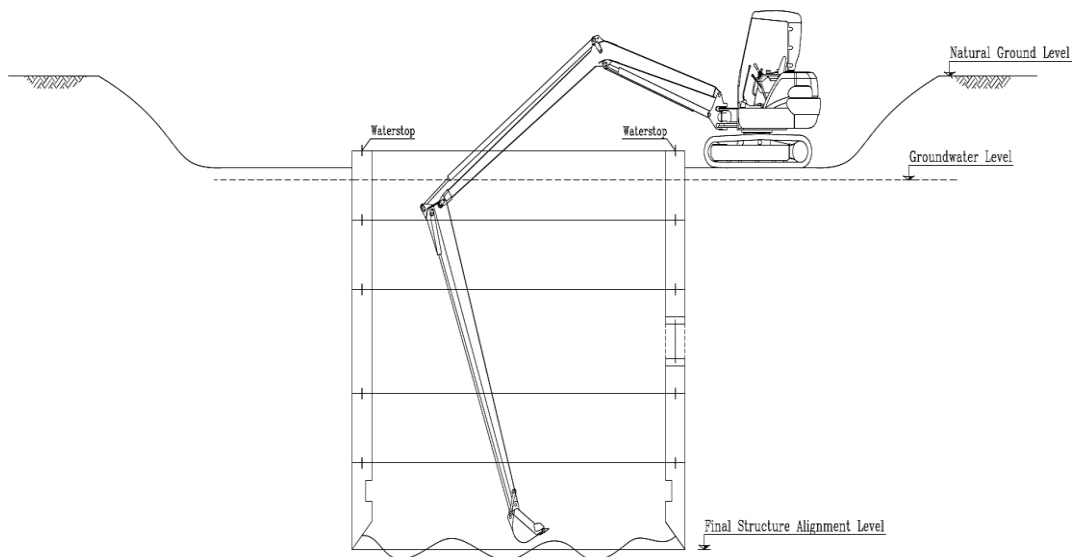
Construction of the next parts of the wall to reach structural foundation level
